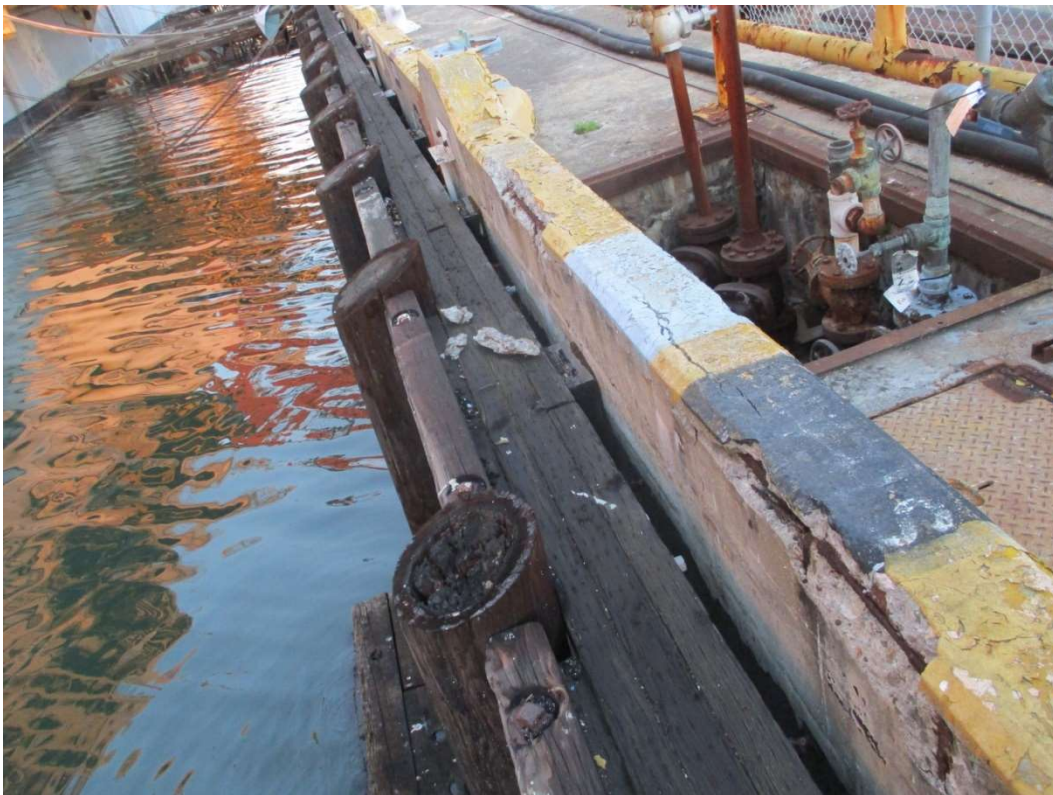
Typical condition of mooring hardware at Pier 3
